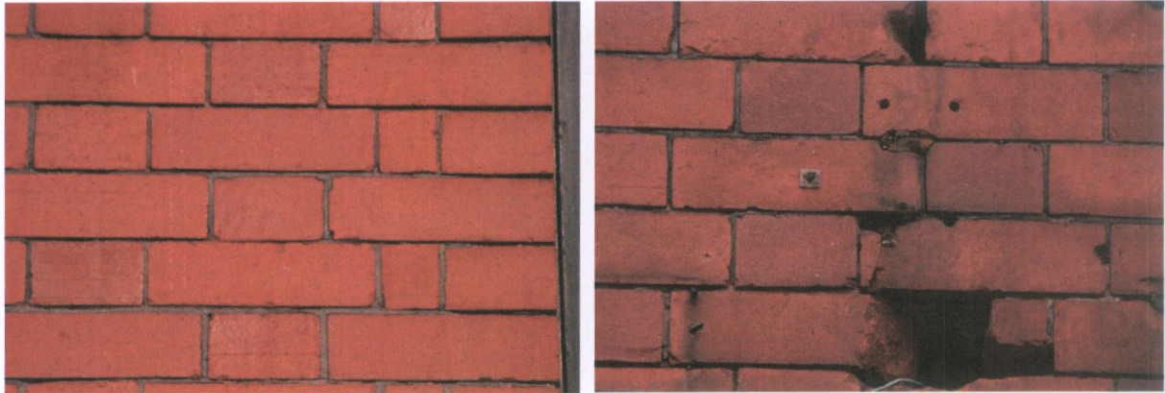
Homogenous red brickwork at first floor level of 1-2 Moore Street showing a grey-coloured Portland Cement-based pointing mortar (but also some joint recession suggesting this may be later repair work). The façade shows some minor damage exposing the bedding (right).
